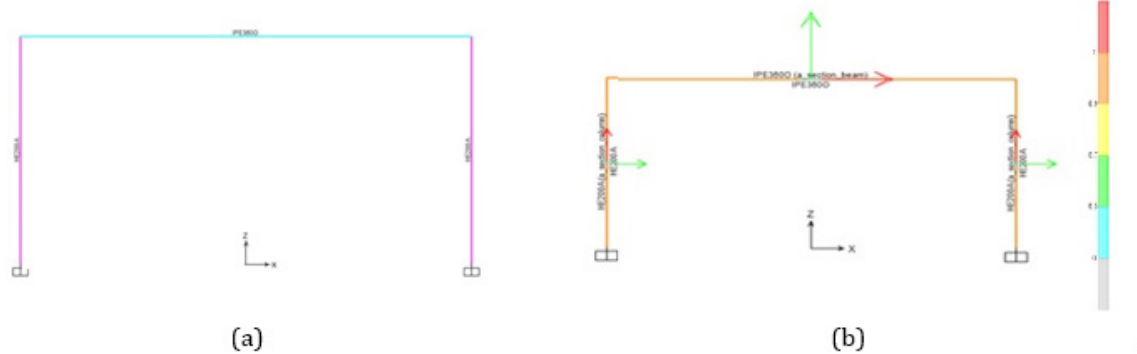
a) Steel structural frame, b) Utilization factors of the sections for the steel frame.
